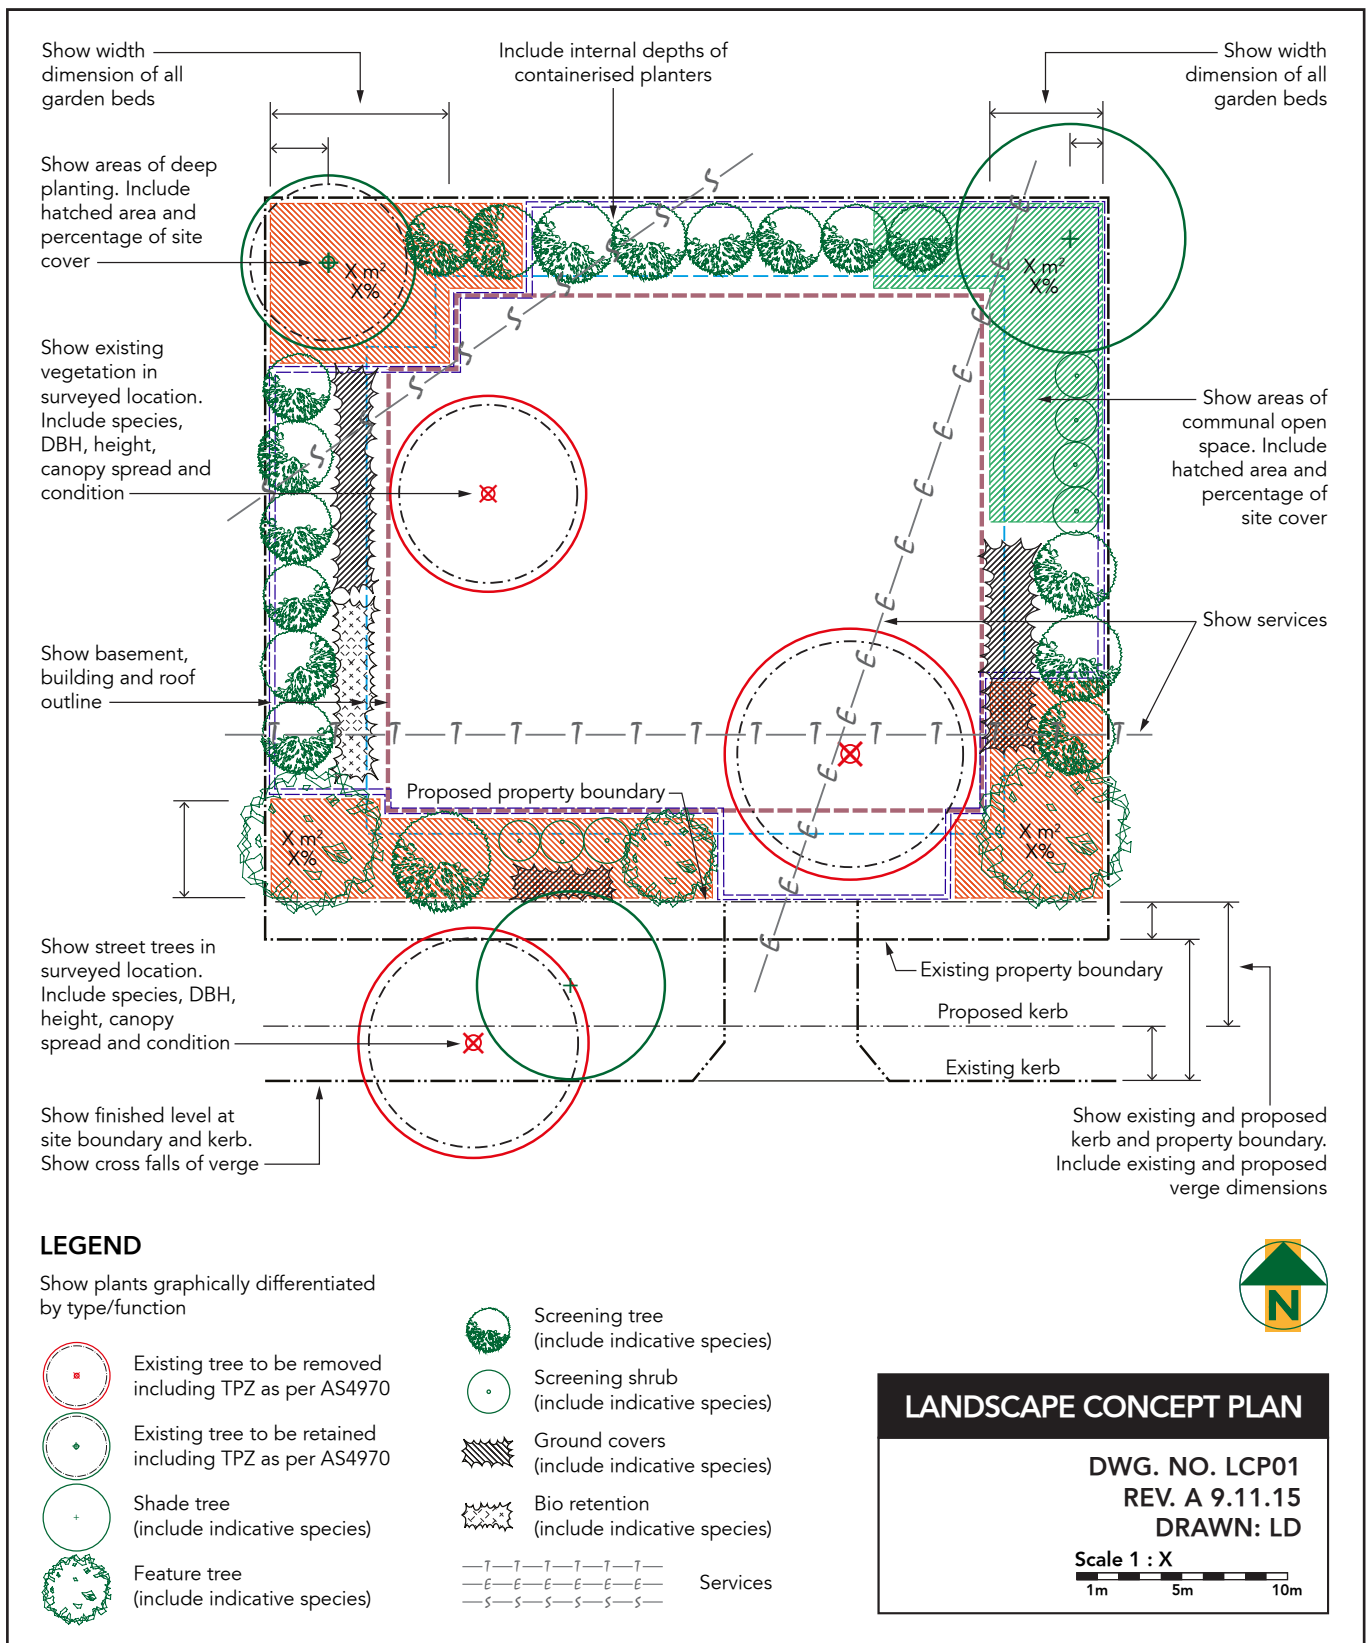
FIGURE A — EXAMPLE LANDSCAPE CONCEPT PLAN
